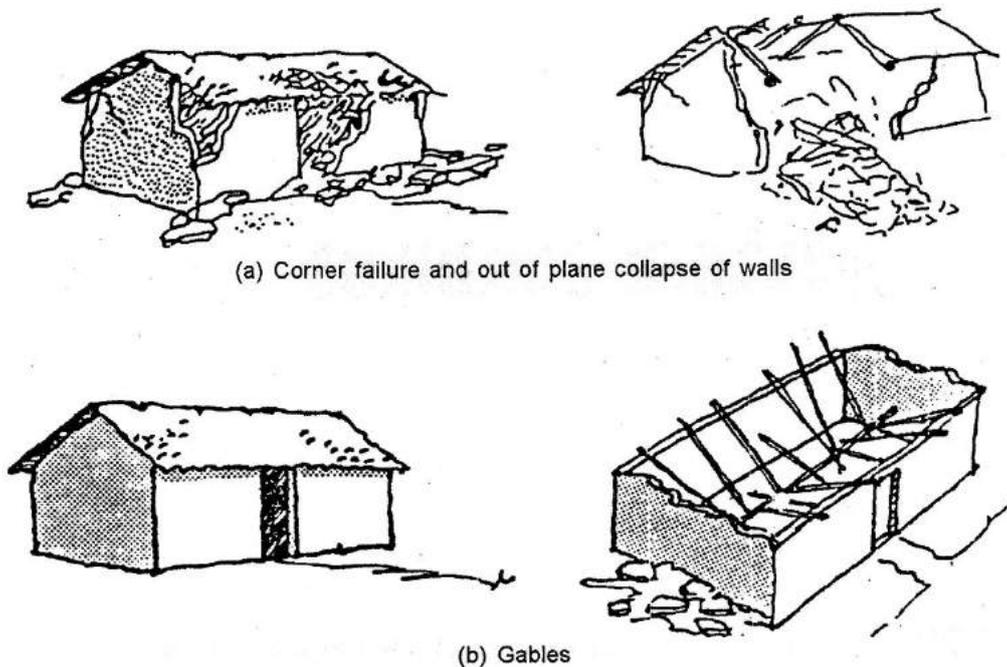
Typical damage and collapse of earthen buildings (from IAEE 2004).
